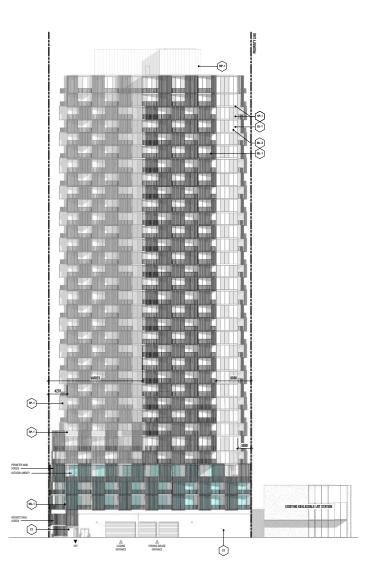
North Elevation (Prepared by gh3 Inc.)
